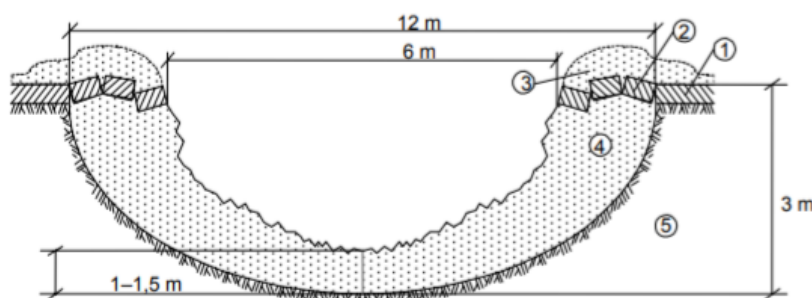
Standard crater according to NATO, 1 - undamaged pavement, 2 - damaged pavement, 3 - soil ejected during the explosion, 4 - loosely deposited soil that fell after the explosion, 5 - native soil [3, 4]
